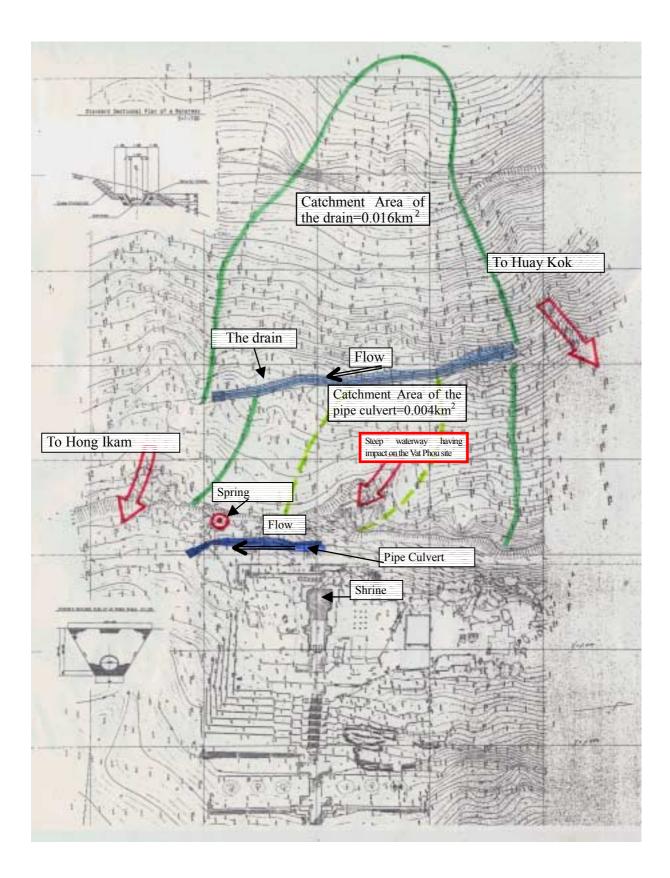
Location Map of Mountainside Drain and Pipe Culvert
